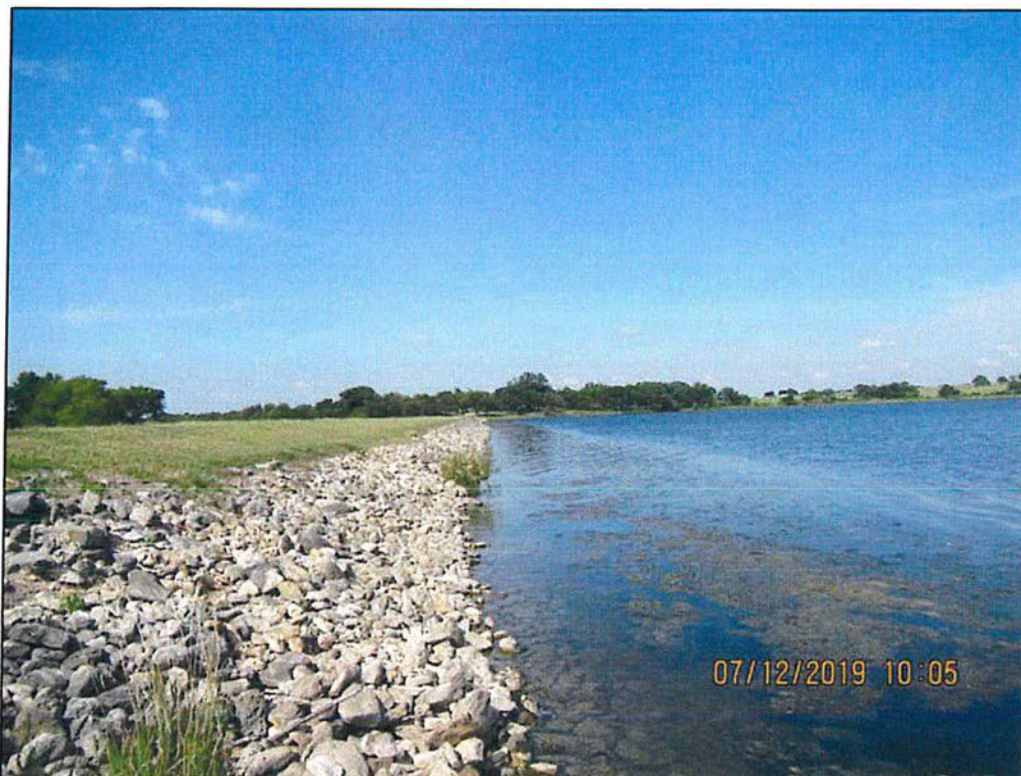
Upstream slope. At service spillway. Looking right. Note minor vegetation in riprap.
